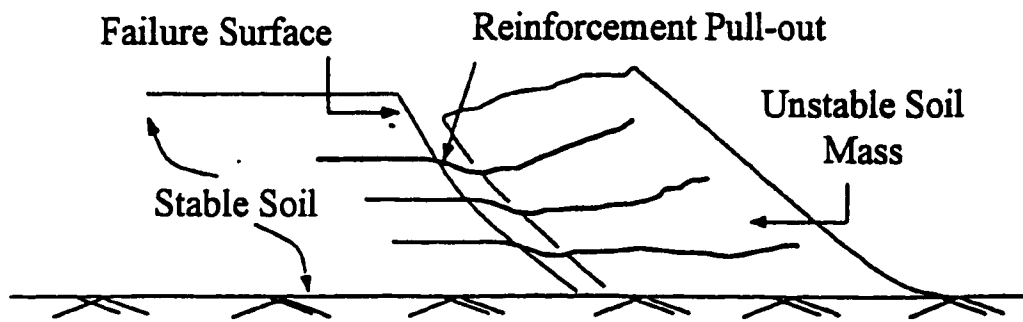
Pull-out failure of reinforcement in soil reinforcement application (Zhai et al., 1996)
